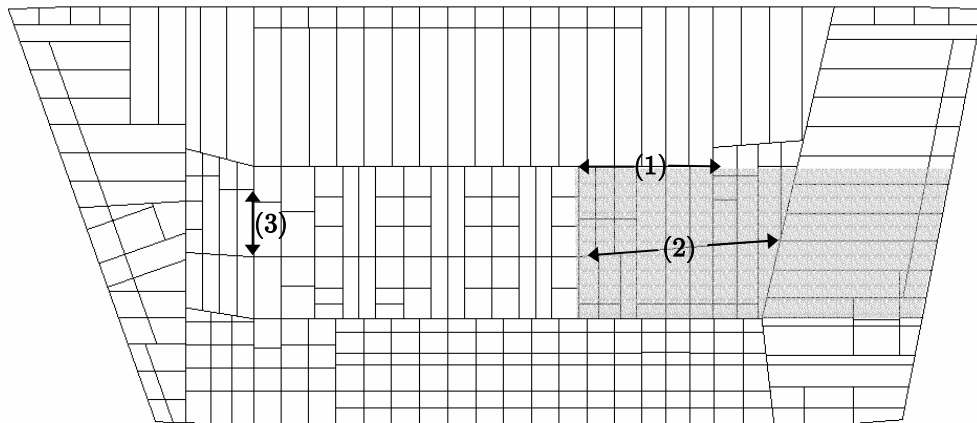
Structural beam layout of Floor 5, with Trusses 1-3 indicated. The shaded area represents the compartment fire.
